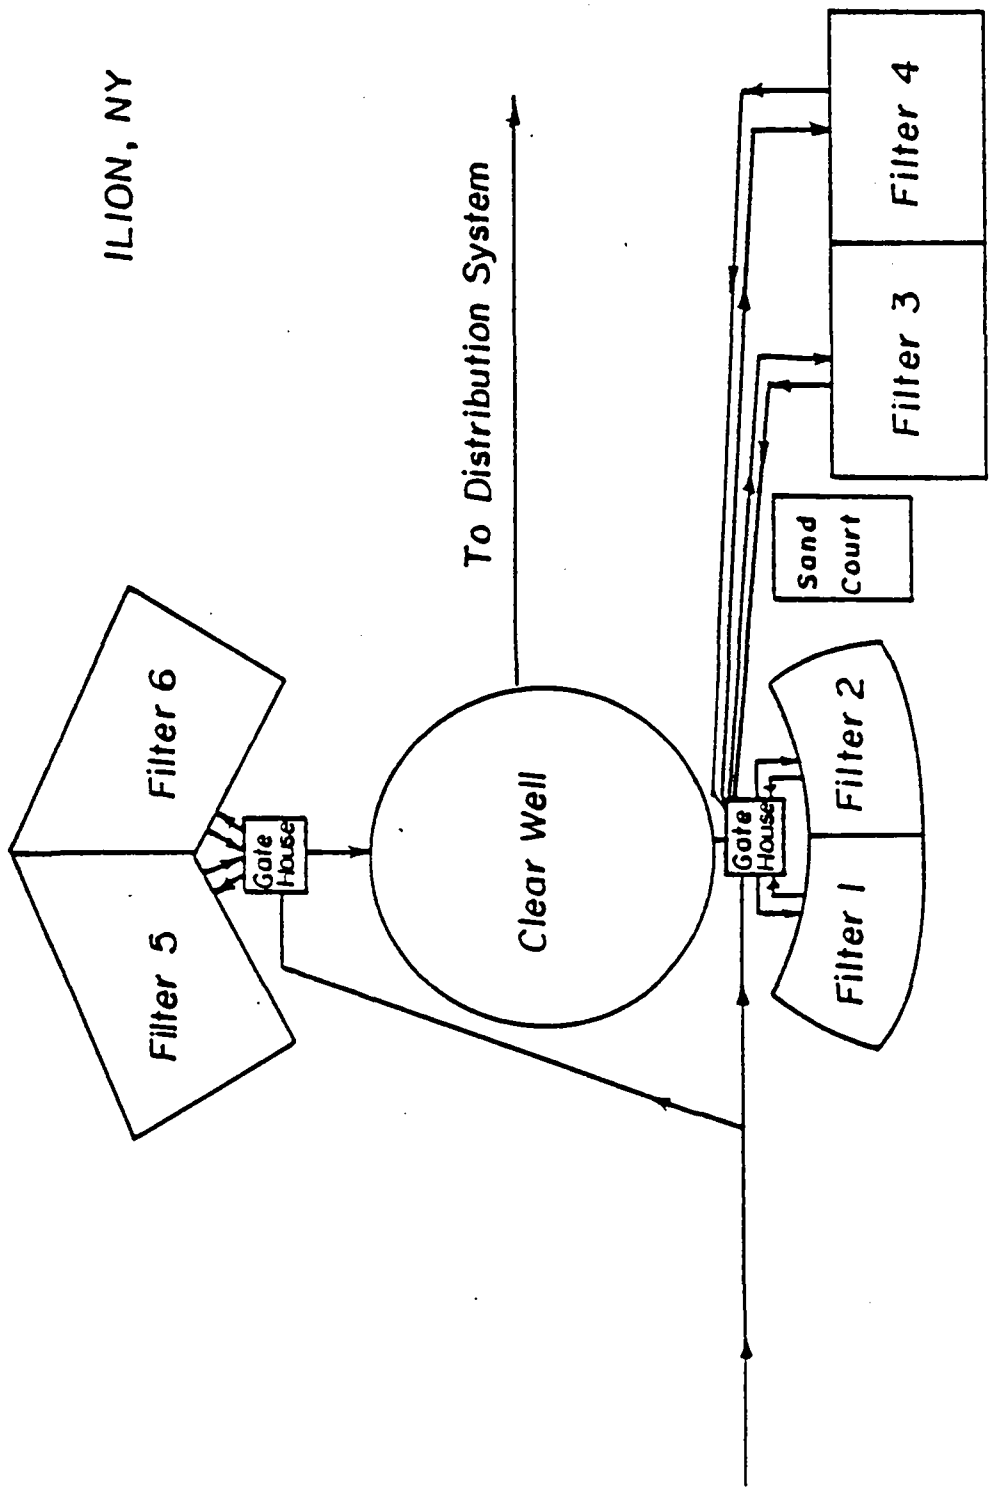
Plan Drawing of the Iliion, Slow Sand Filtration Plant.
